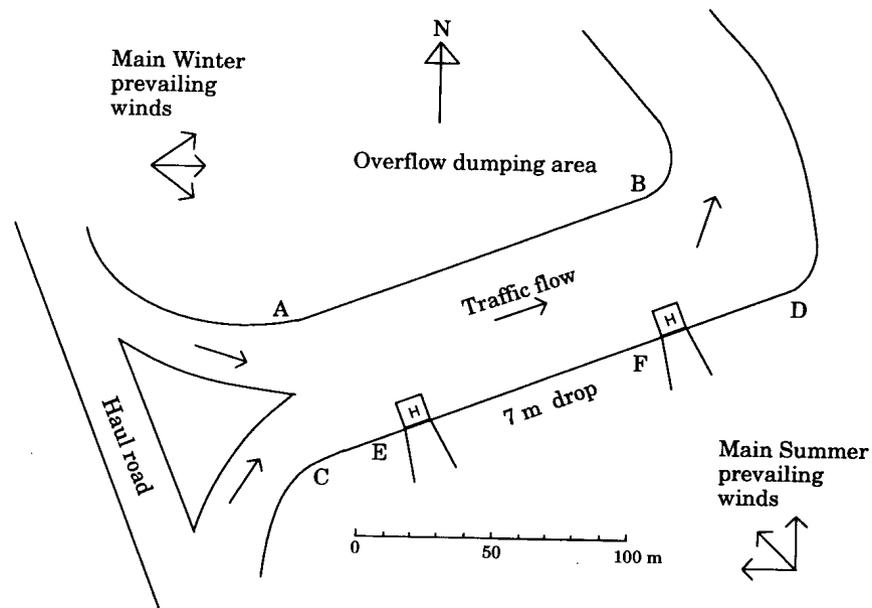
Ground plan of the dumping site at Warkworth's Singleton mine. The two squares labelled H represent the dumping hoppers.
